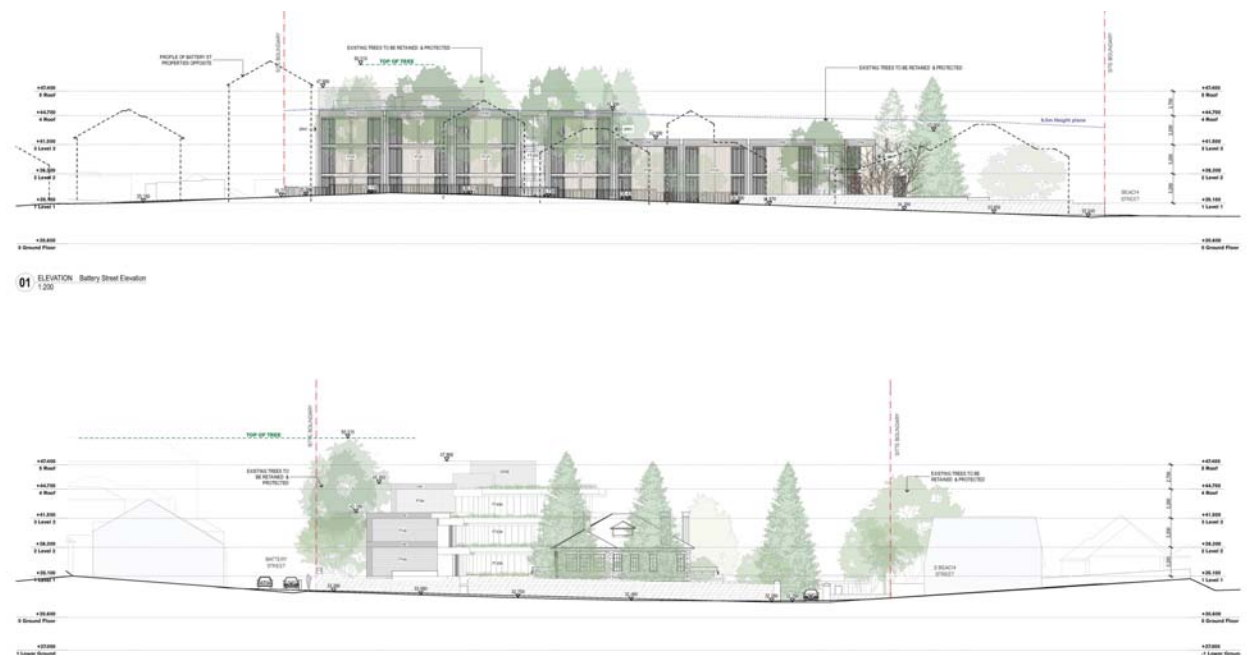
Battery Street elevation (top) and Beach Street elevation (bottom) of the proposal (courtesy of FJMT)
